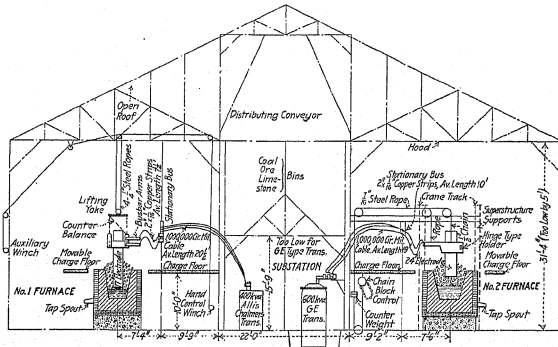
SECTIONAL ELEVATION OF PLANT.
